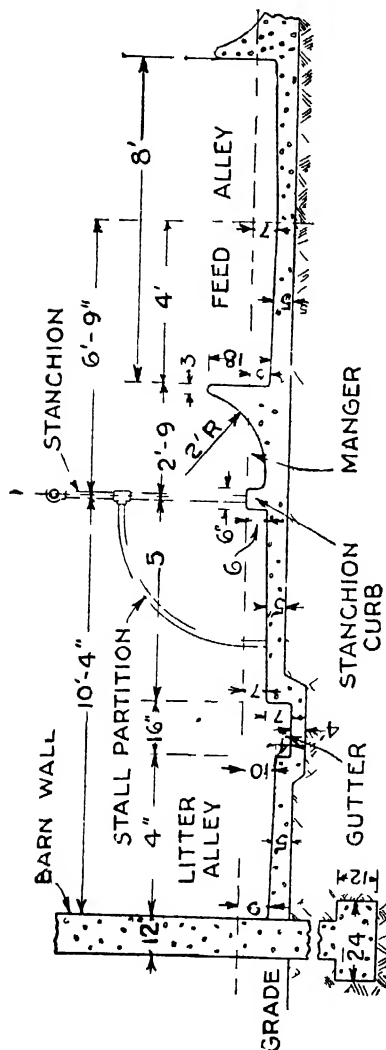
800 —Dairy barn construction 1 Cross section of dairy barn floor
